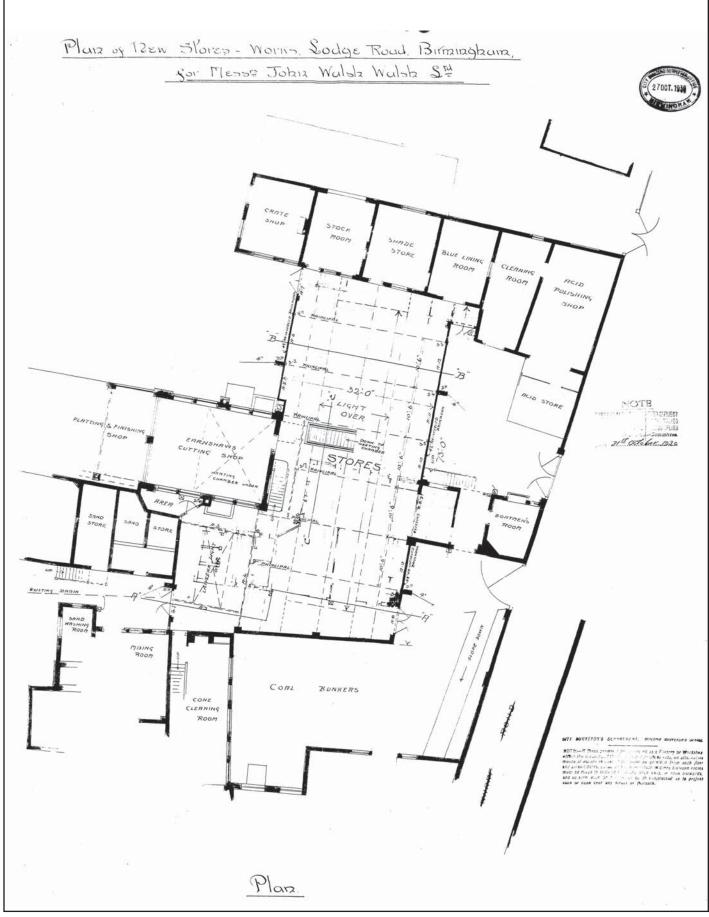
Design Drawings for Building D: Floor Plans, April 1934
